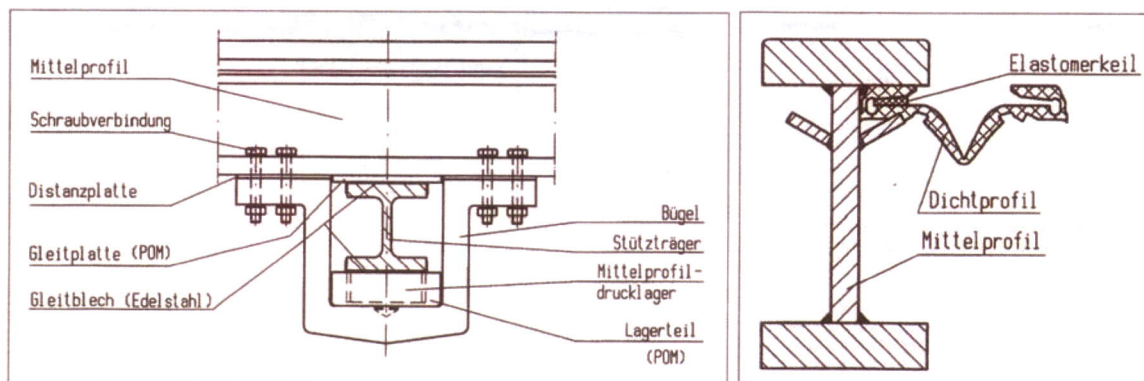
Left: Cross section of the connection between the support bar and a centre beam;
